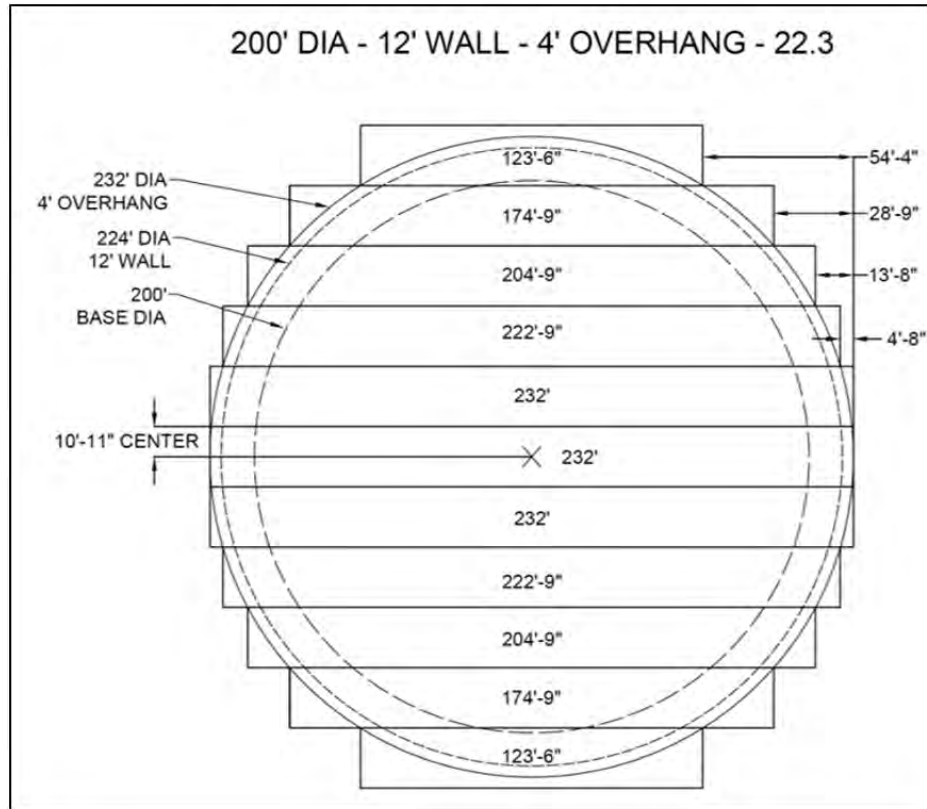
Typical bucket liner manufacturer drawing for field/factory assembly
